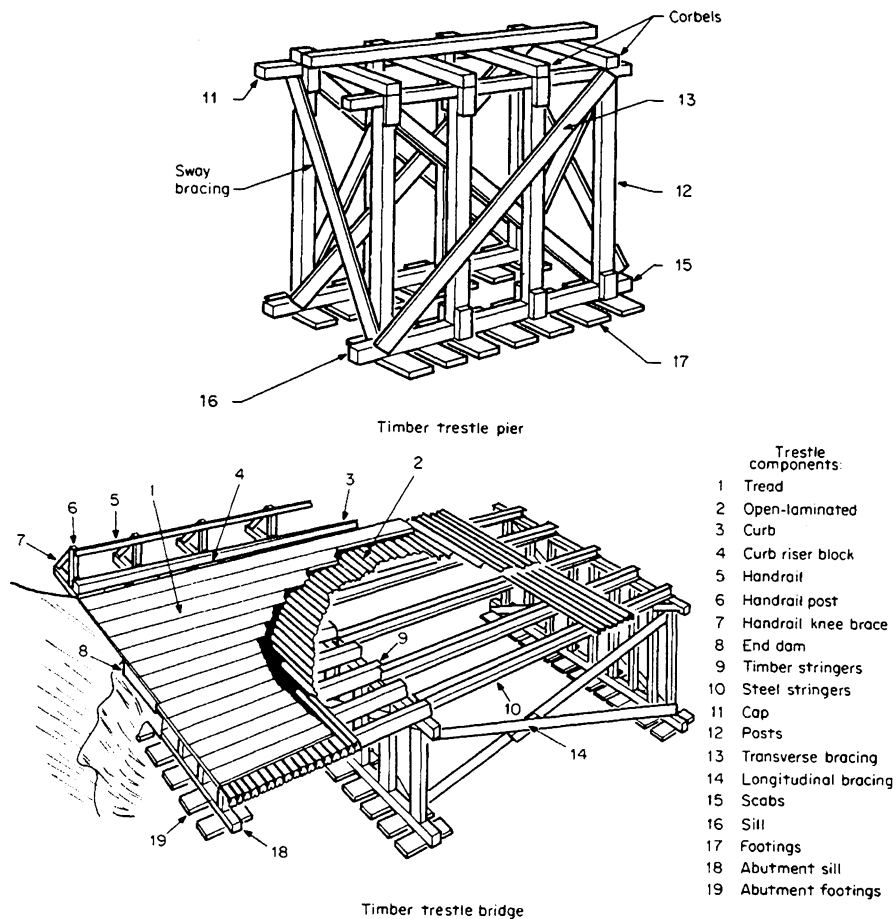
Typical Timber Trestle Pier and Bridge
